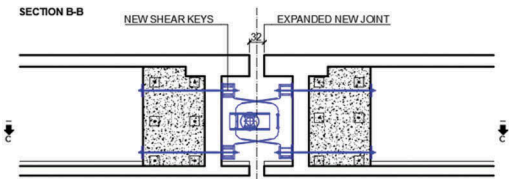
Project configuration: overview of deck vertical section - Installation of new shear keys.
